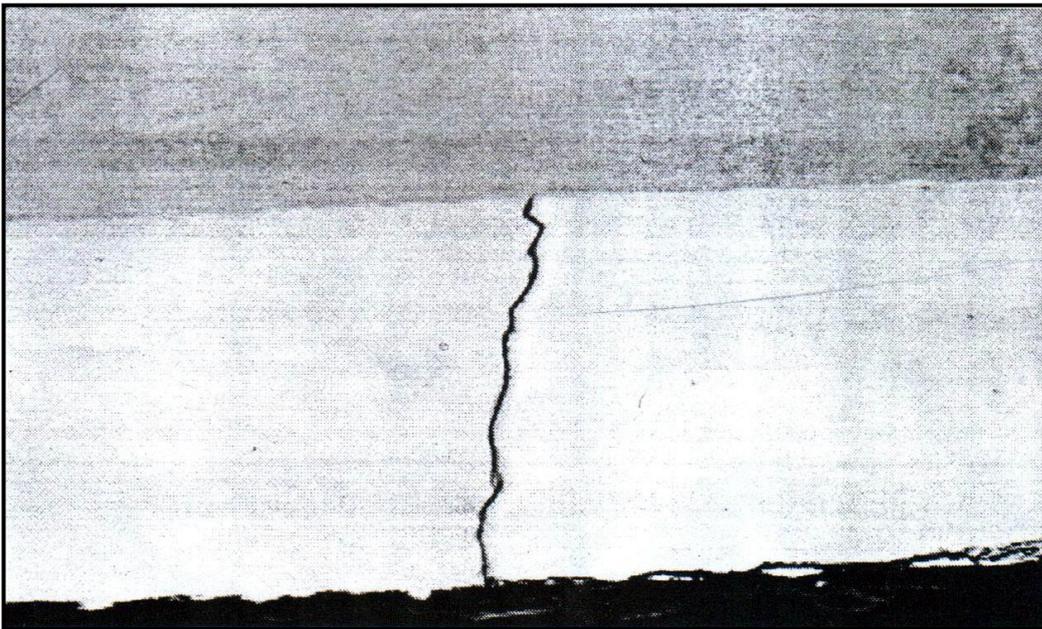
The Crack Location in Specimen (BM_{٧,٥})
